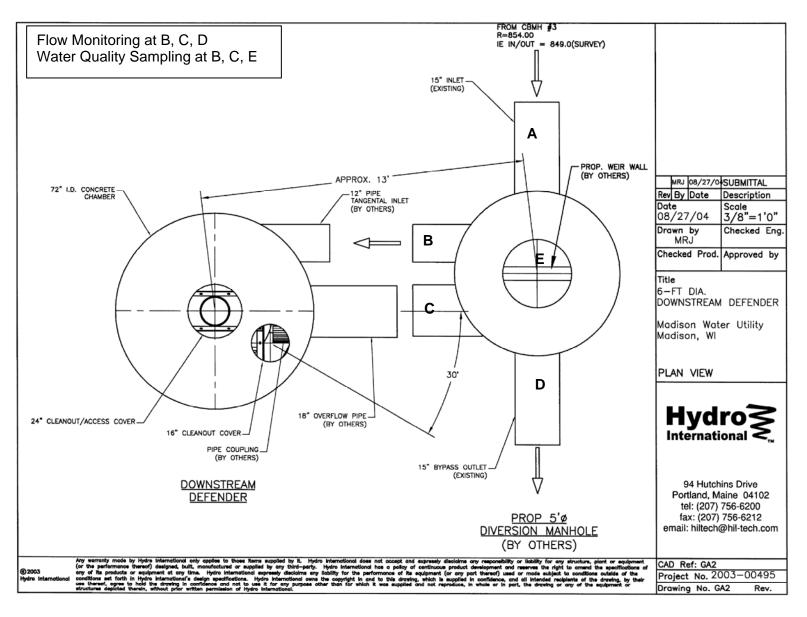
Plan View of the Downstream Defender<sup>®</sup>, Madison, WI.
